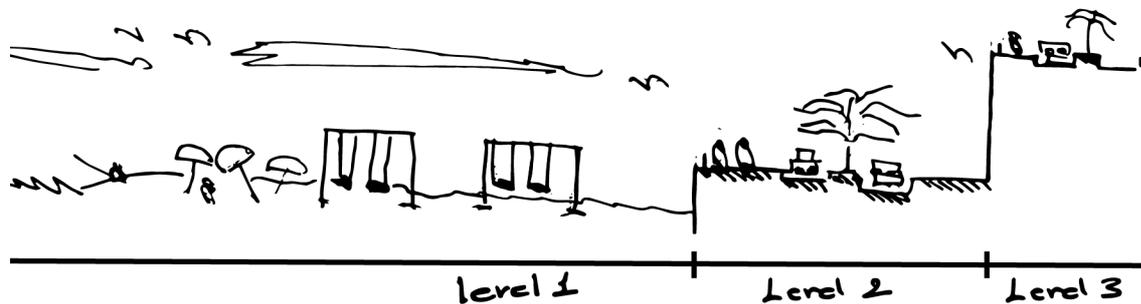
Ramlet Al Bayda Public Beach section sketch
